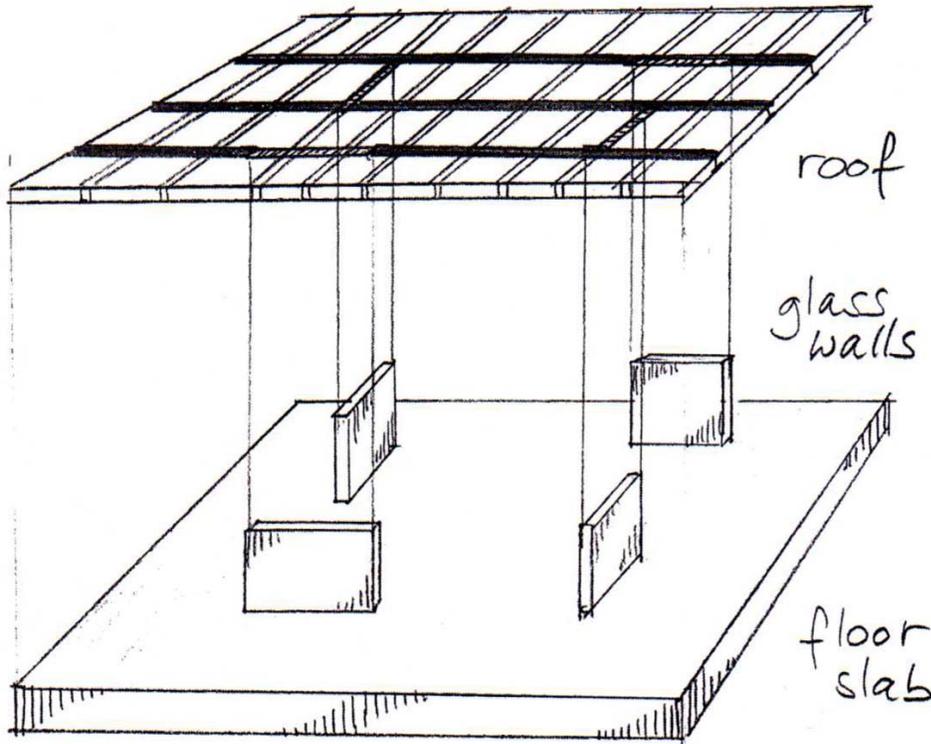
Sketch of Structural Glass Wall and Roof Structure (Nijse 108)
